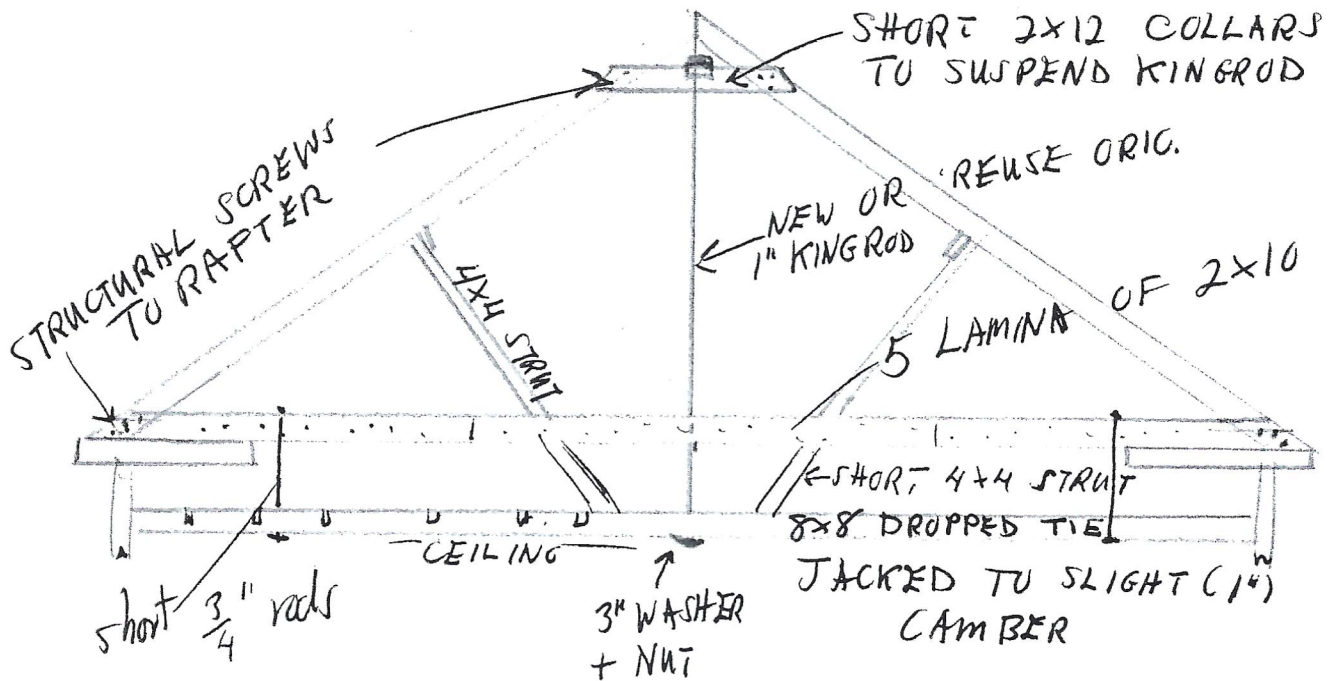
REPAIR: RETAINING DROPPED TIE BEAM
